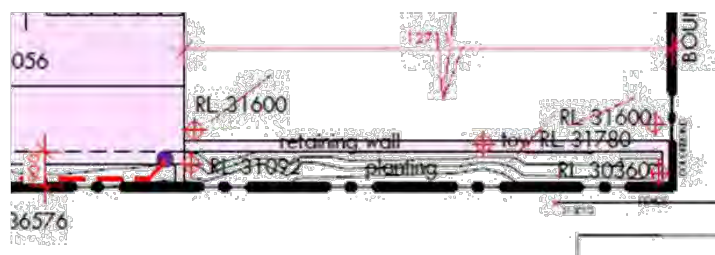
Retaining wall setback approved under DA-2017/216 (Original application)
